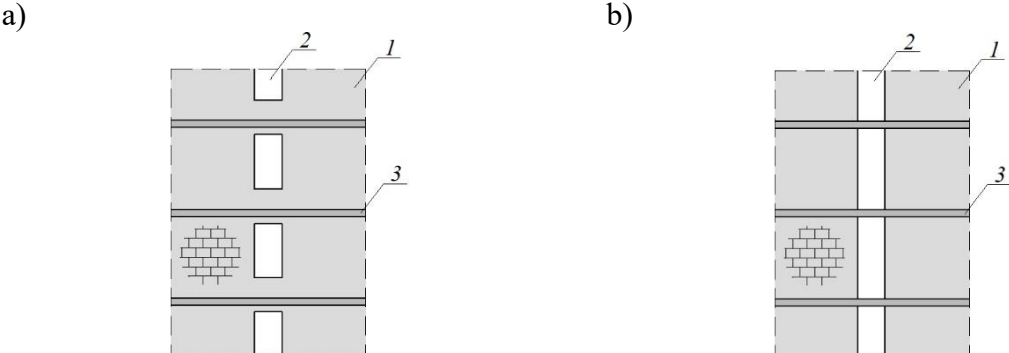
The effects of openings in shear walls: a) coupled stiffening wall, b) noncoupled stiffening wall: 1 – stiffening wall, 2 – opening, 3 – slab
